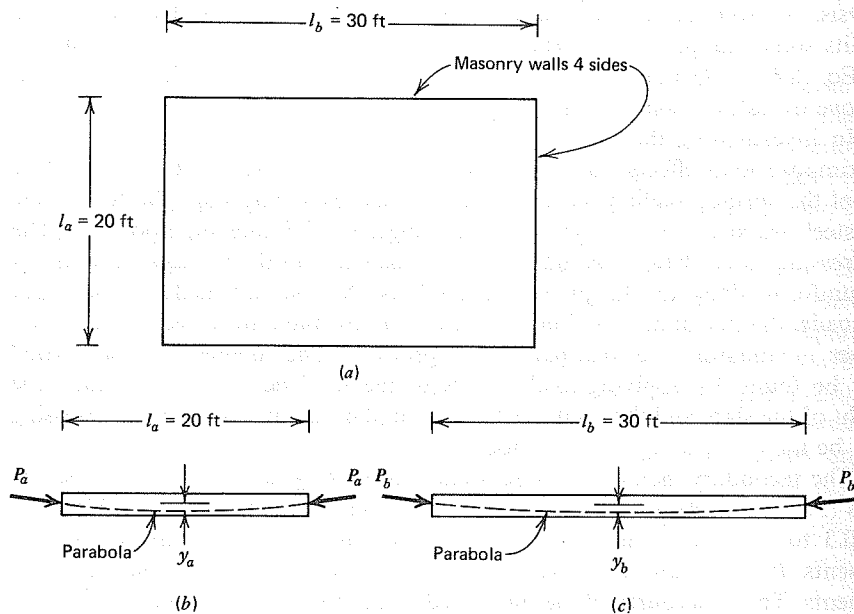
Design example: two-way slab. (a) Plan view. (b) Profile of short span. (c) Profile of long span.
